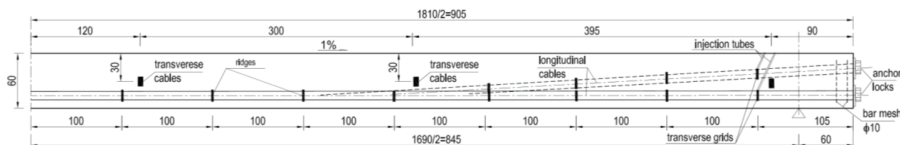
Prestressed concrete bridge slab, the course of prestressing cables [22].
